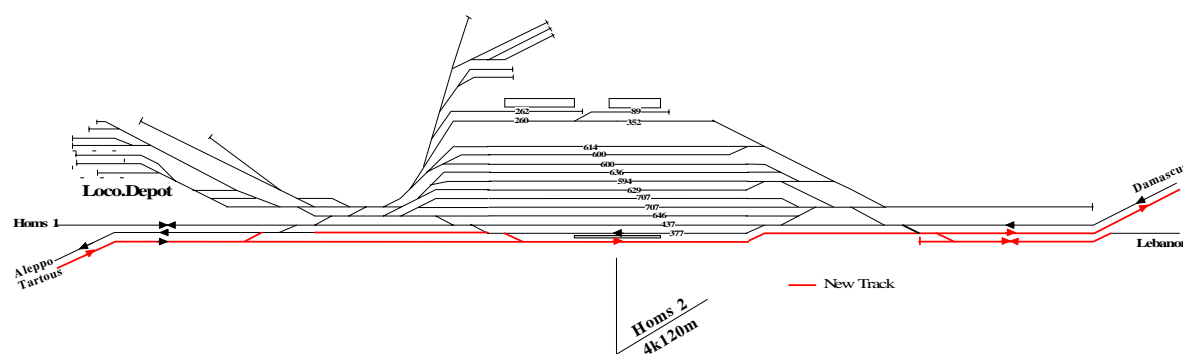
Sketch of Homs 2 station improvement track layout
